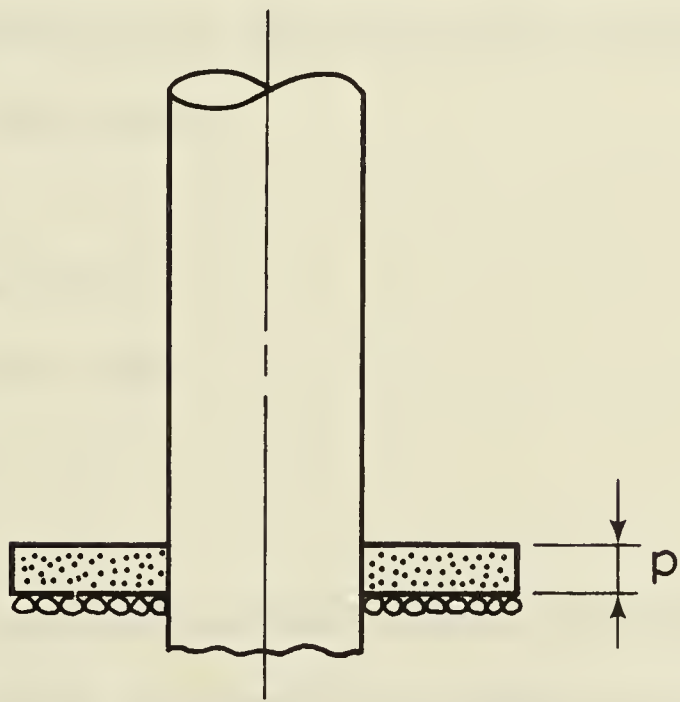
(a) FLAT PIER RIPRAP IN ELEVATION
